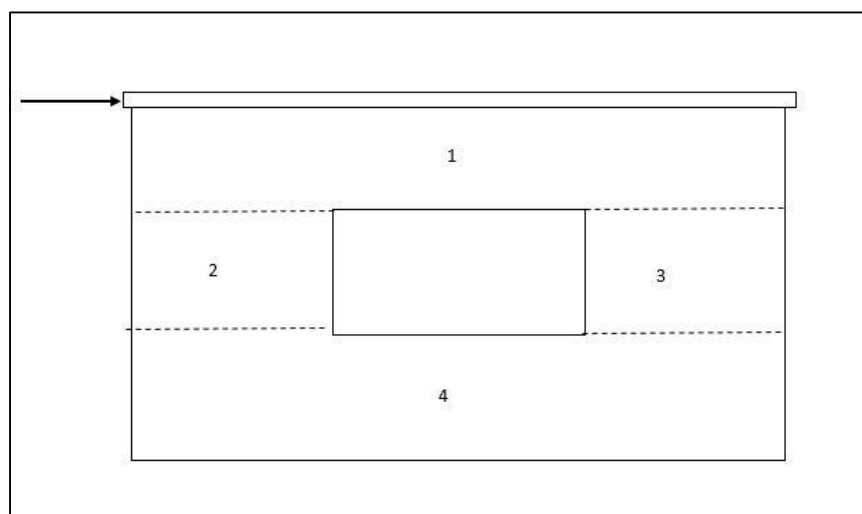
Schematic diagram of force distribution among piers by pier analysis method
